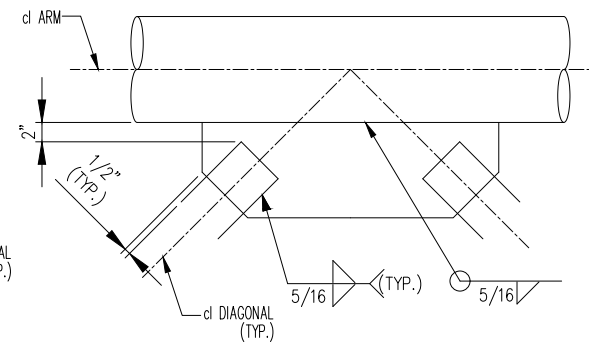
(WELDED CONNECTION ALTERNATIVE)
